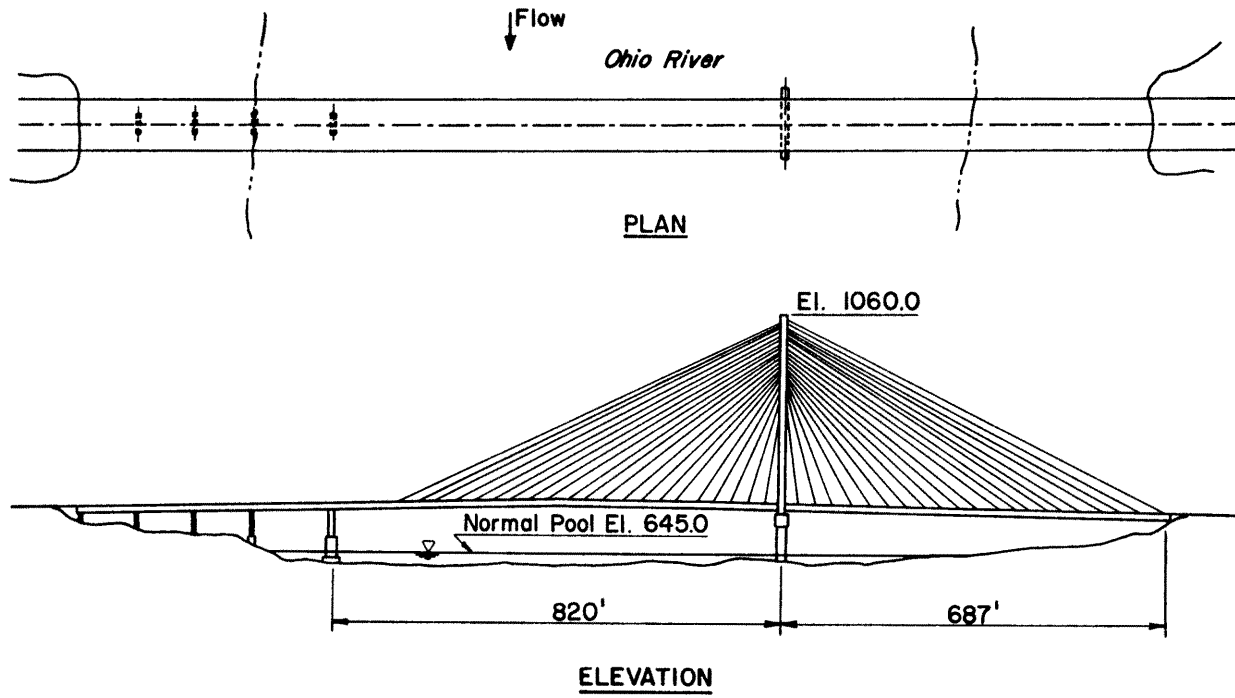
Main Spans of Weirton-Steubenville Cable-Stayed Bridge
